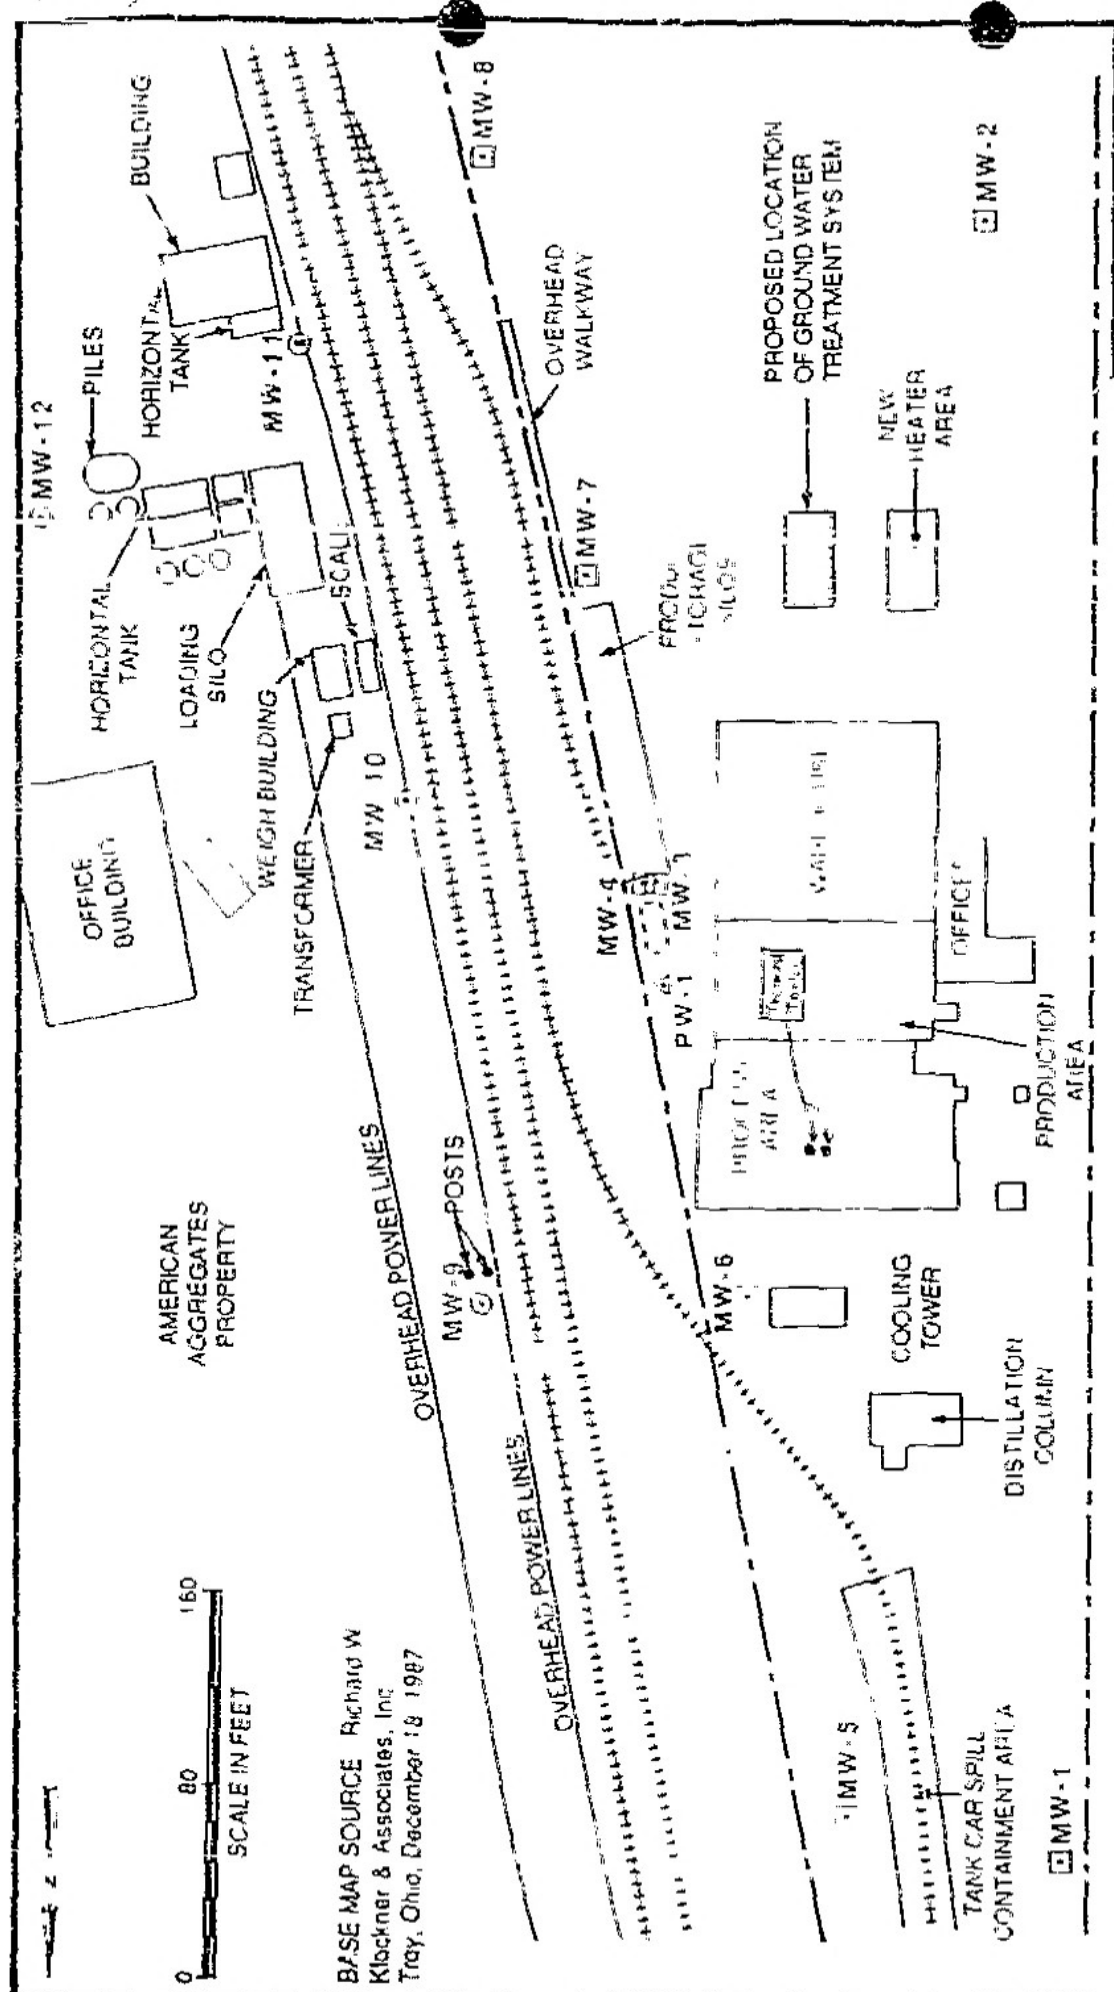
PLANT PLOT PLAN WITH MONITORING WELL LOCATIONS
